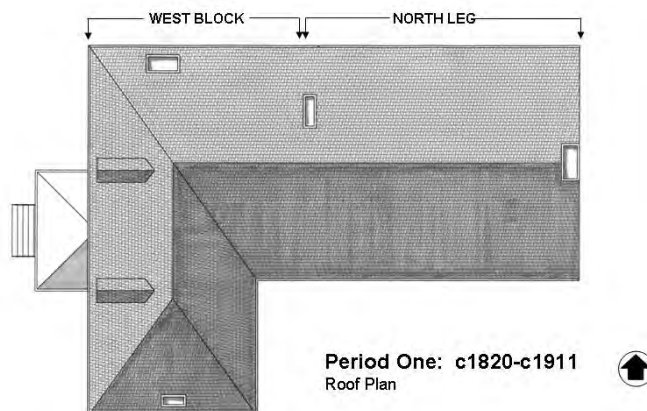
Roof plan showing the massing of the original Period One layout of the Ferry Hill Plantation House. (GWWO, 2005.)
